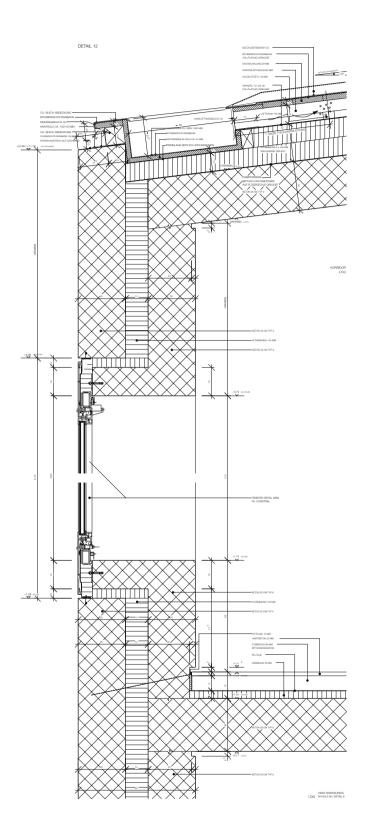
Section through classroom window, 1:20 1:5 working drawing (reduced)
